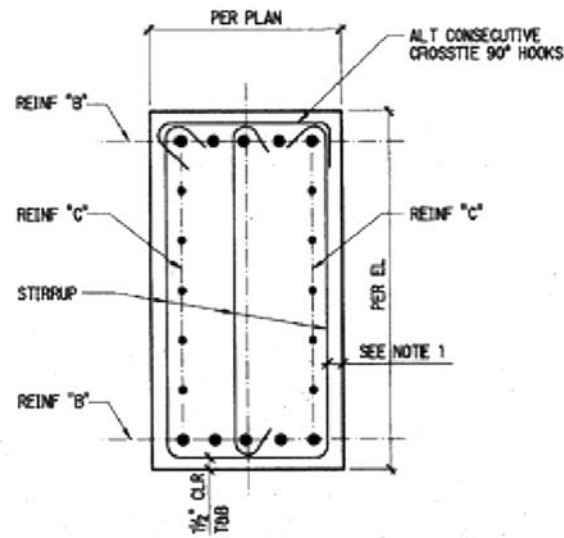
Variable Coupling Beam per Plan: Lower Level 1 – Level 9
